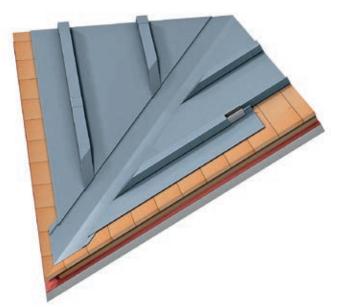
Valley with single seam, permissible roof pitch > 30°
